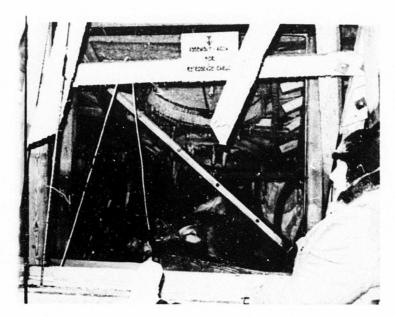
Heavy steel is bent and large timbers are snapped by snow pressures exerted upon the framework of an air blast cooler housing (Trench 5).
